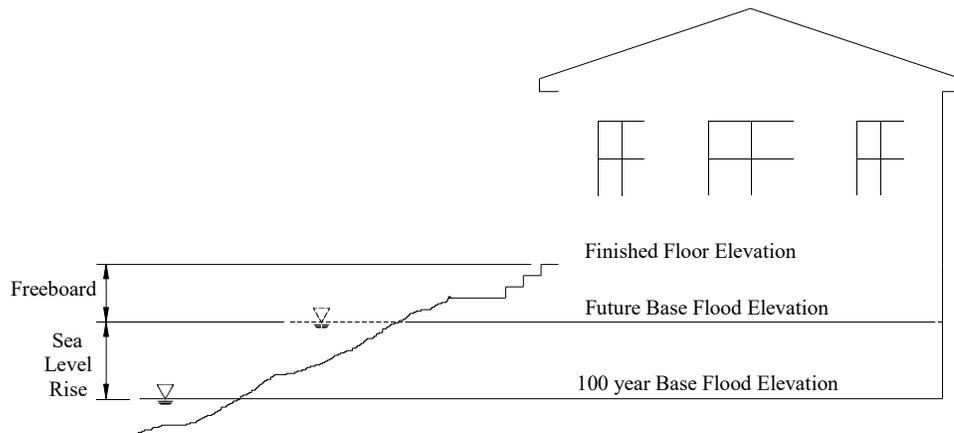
Coastal Area Finished Floor Elevation relative to the Base Flood Elevation. (Note: For Coastal High Hazard and Coastal Zone A above requirements apply to the Bottom of the Lowest Supporting Horizontal Structural Member of Lowest Floor.)
